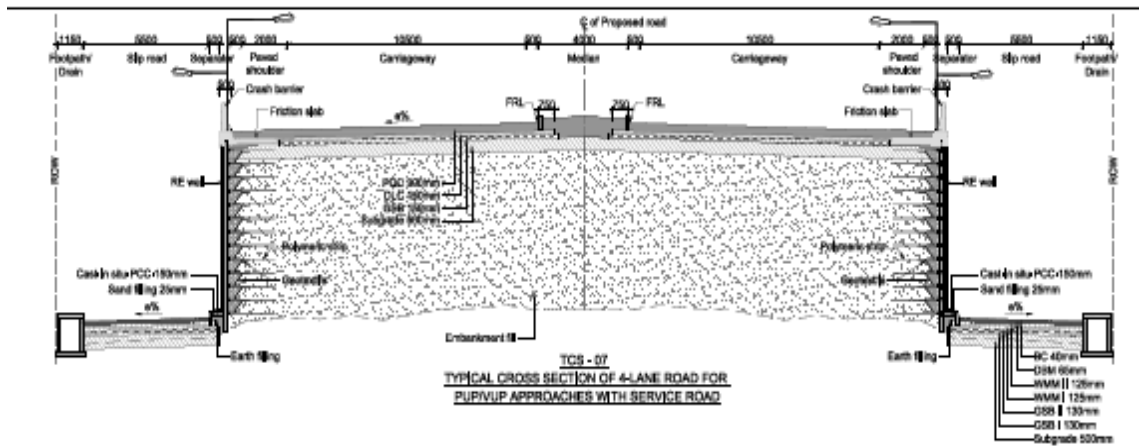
TCS-7 4-lane road for PUP/VUP approaches with service road
